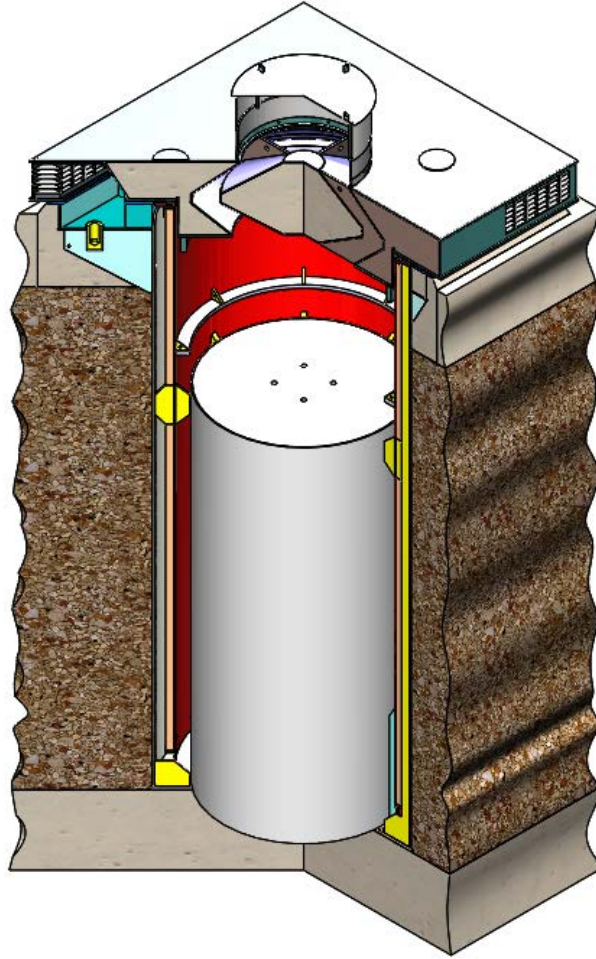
(b): VVM Components Shown in Assembled, Cut-Away View
